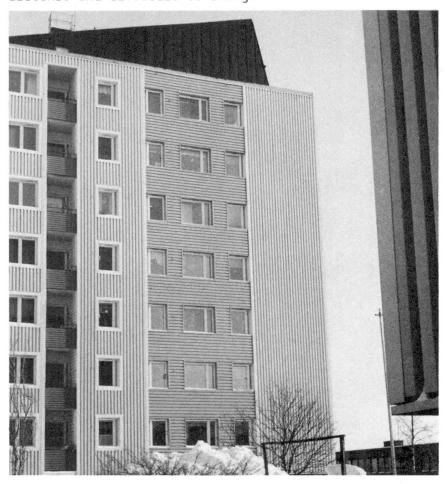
High-risebuildings are simple to renovate with steel sheet
